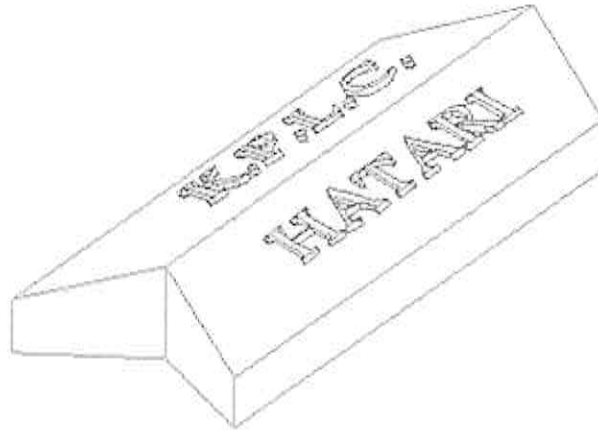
CONCRETE HATARI SLAB TO COVER H.T. CABLES
